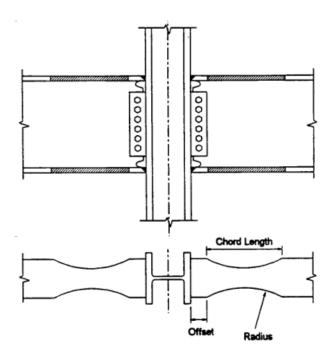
Reduced Beam Section (RBS) Connection
